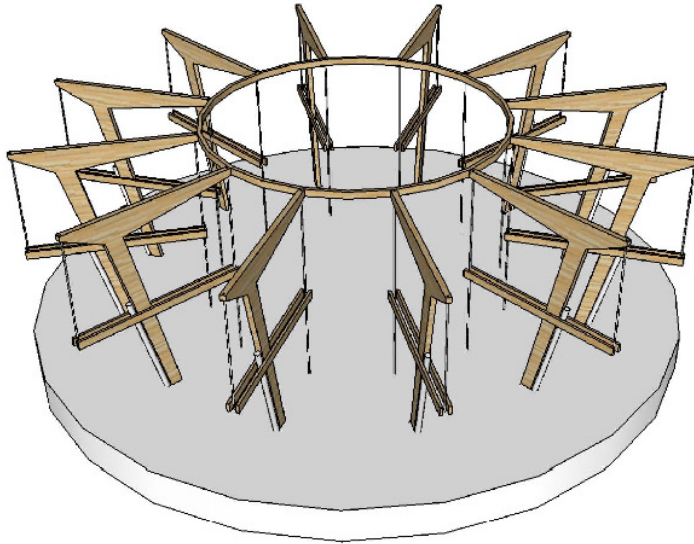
Laminated wooden elements form the main structural concept [illustration credit: Rudy Uytenhaak Architects]
